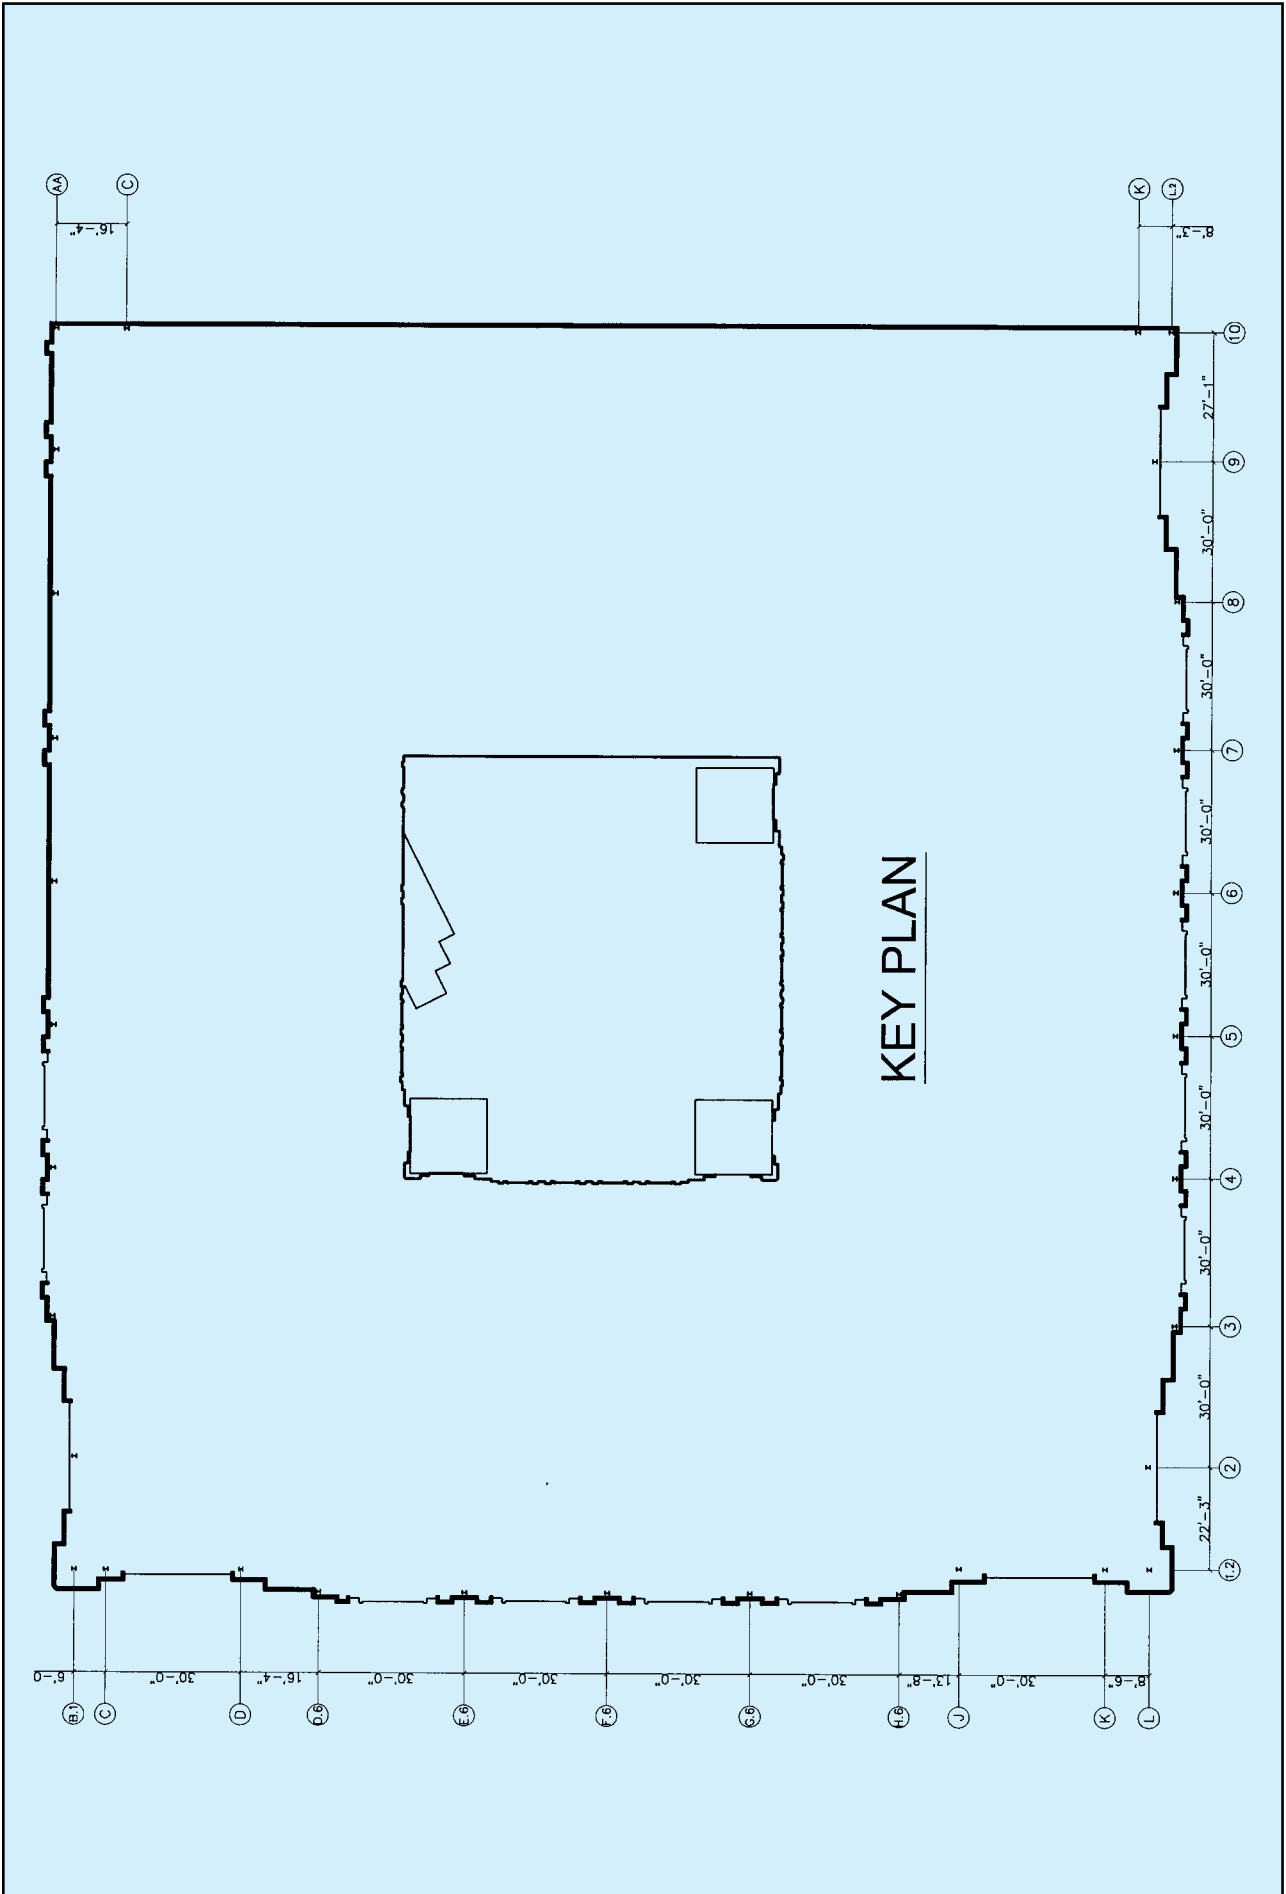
North and south plan of perimeter of building showing location of precast panels.
